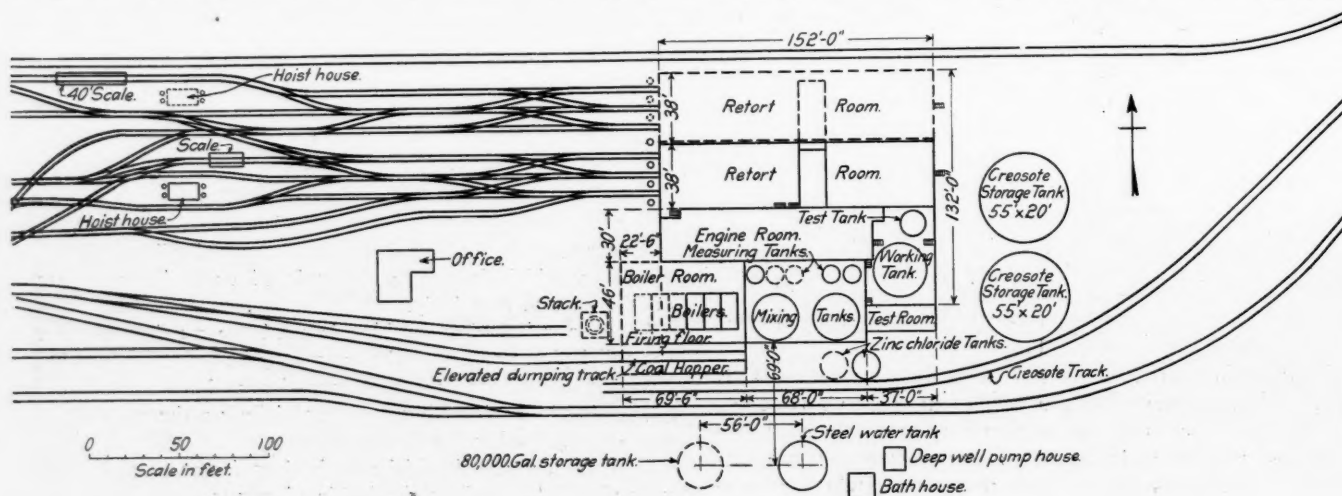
Plan of New Facilities at Galesburg Tie Plant.
